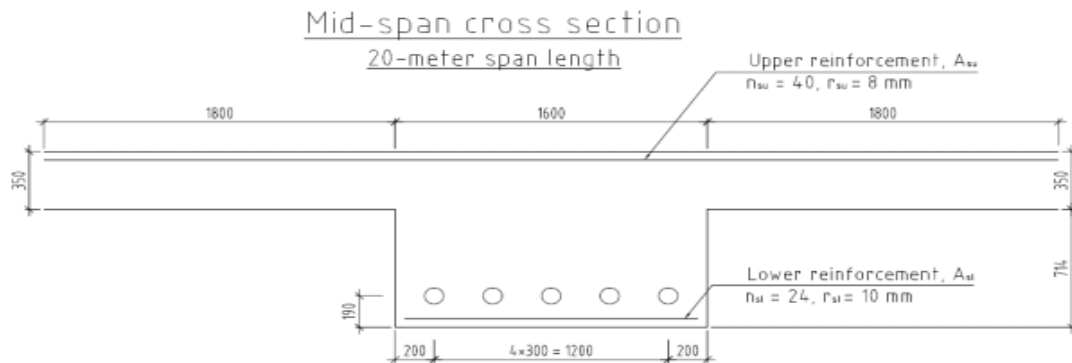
Mid-span cross section of bridge model with span-length 20 meters.
